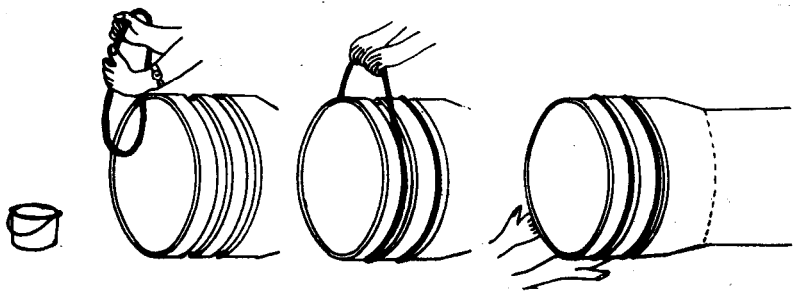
FIXING OF RUBBER GASKET ON SPIGOT
